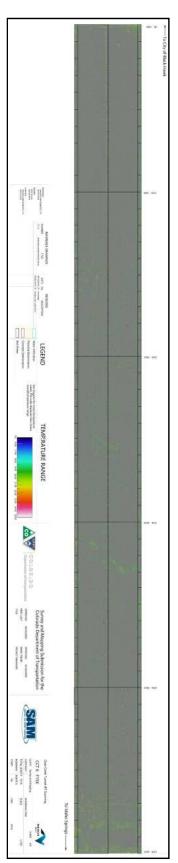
Tunnel 6 Auto Detection, Bolt Plates
